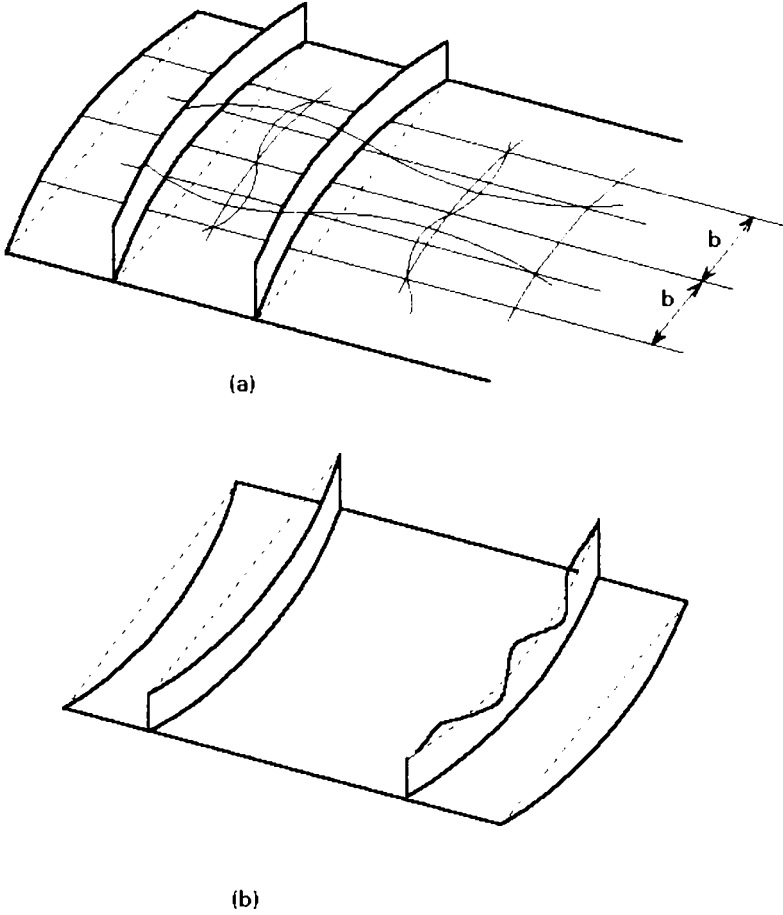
Geometrical imperfections favouring (a) plate failure, (b) stiffener failure
